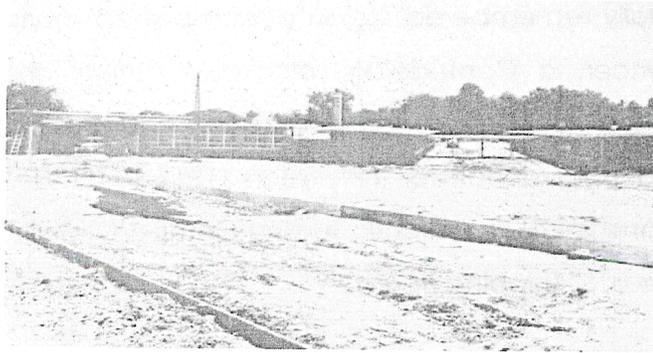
Construction of New Paulsen School, n.d.<sup>307</sup>
